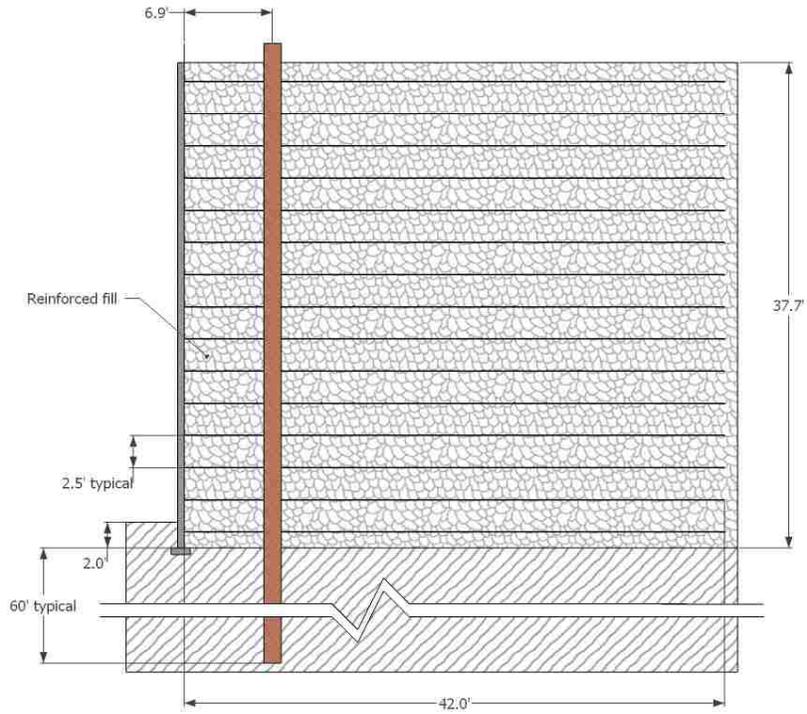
Plan view of the north abutment for the Pioneer Crossing bridge over UPRR.
